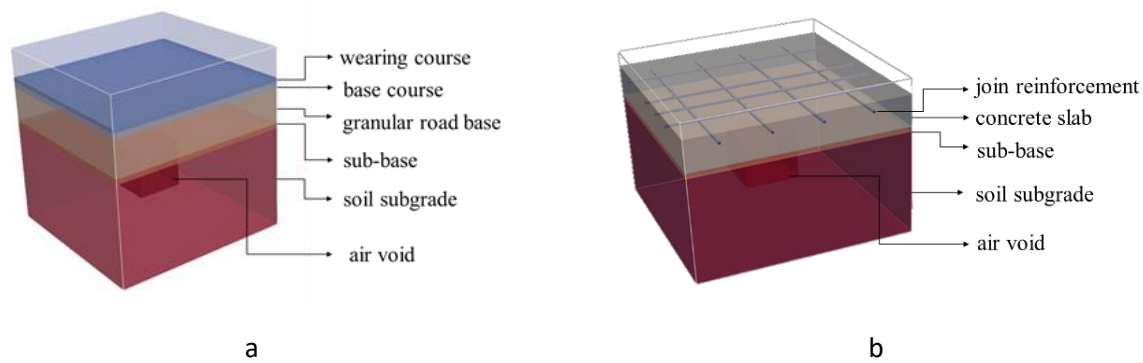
Simulation model of two typical road structures: (a) is a bituminous road model, and (b) is a concrete road model
